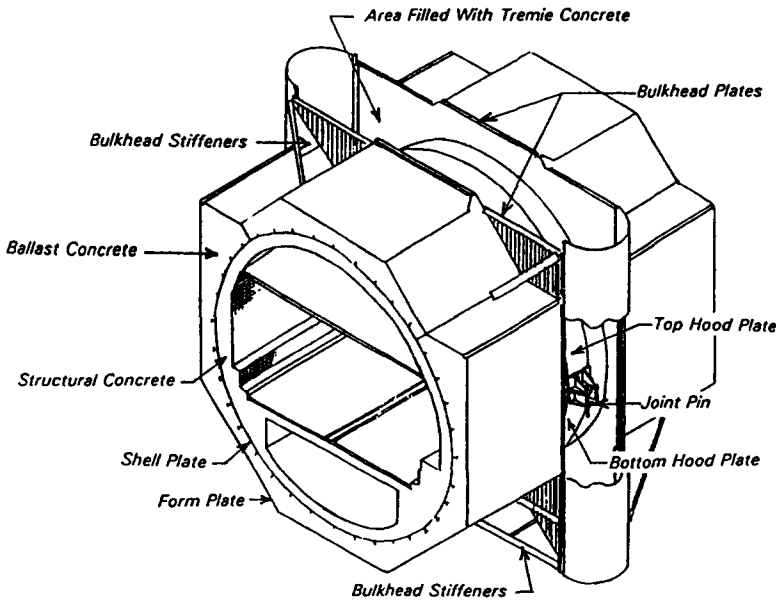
Typical tremie concrete joint for a typical steel double-shell structure.
